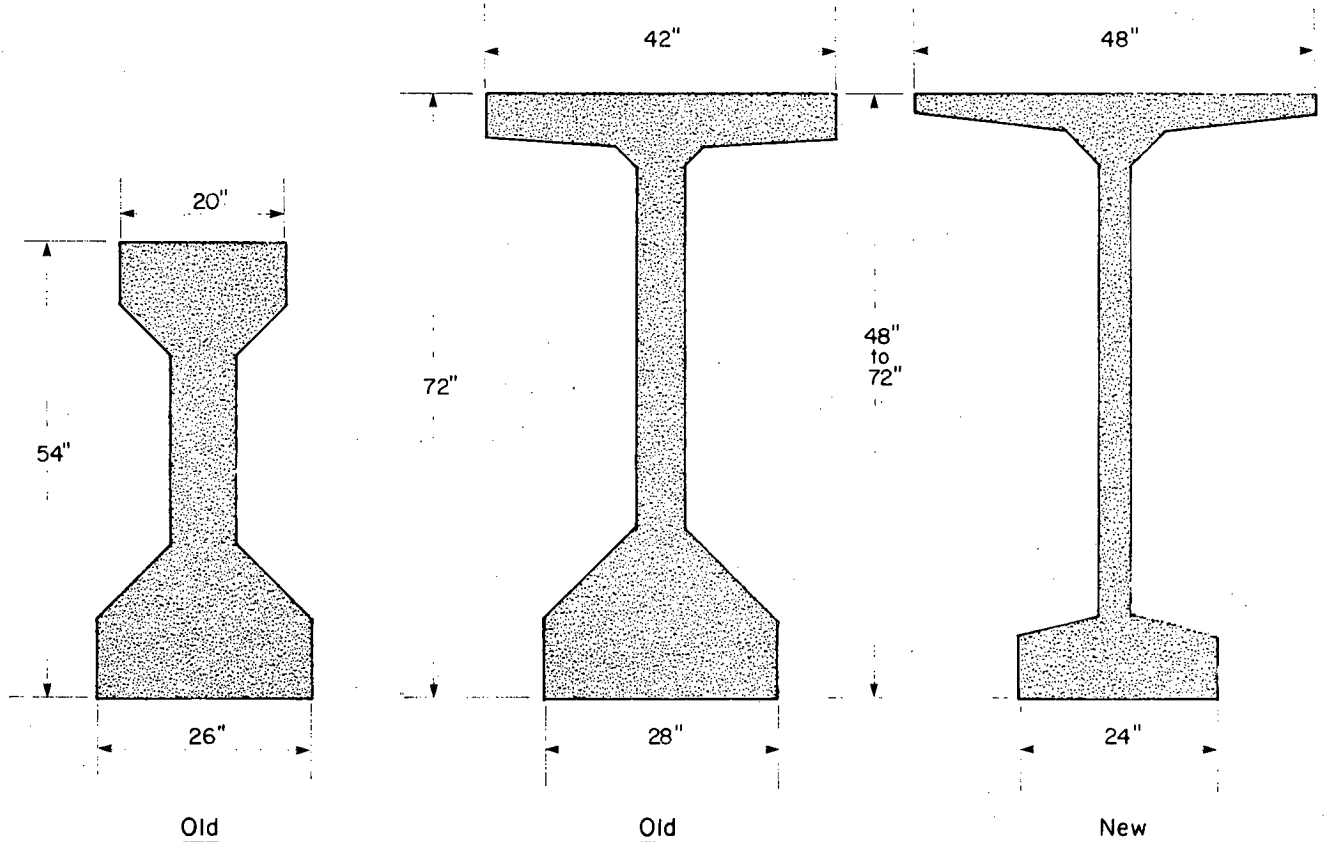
Modified bulb-T proposed to replace standard AASHTO-PCI type IV, V, and VI sections (Concrete Technology Laboratories).
